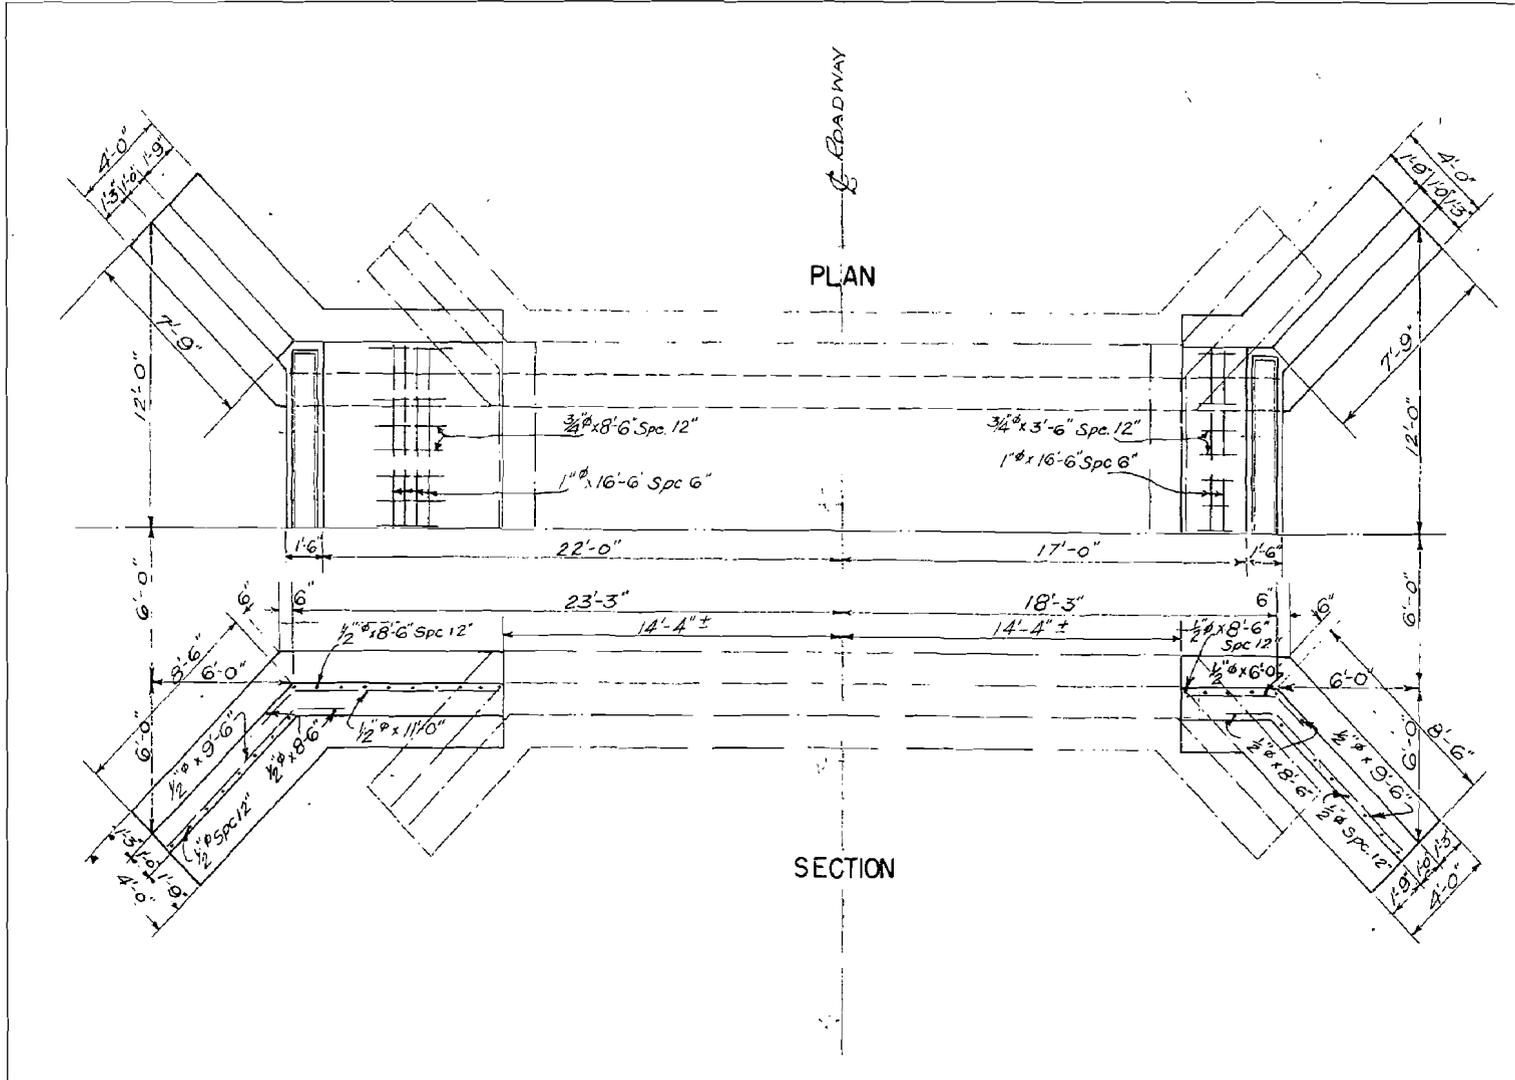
1948 Bridge Reconstruction Plans Superimposed on 1924 Plans
